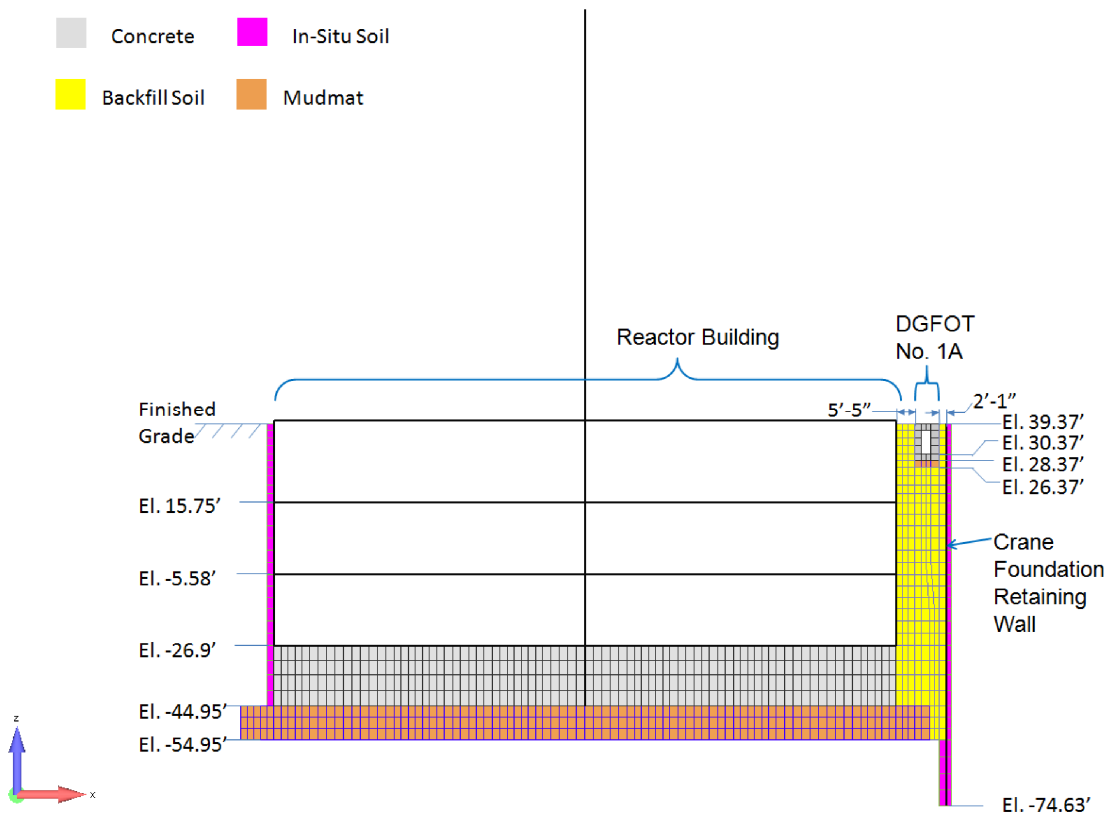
H.7-21 2D SSSI Model of RB, DGFOT and Crane Foundation Retaining Wall
